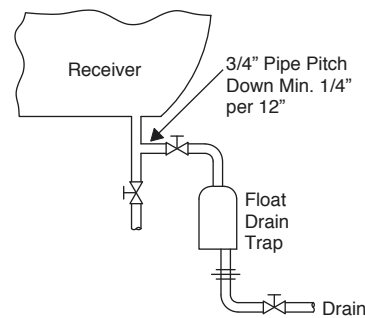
Install the drain trap on side to get better access or compensate for lack of space under the receiver (particularly for drain trap used under compressors).
